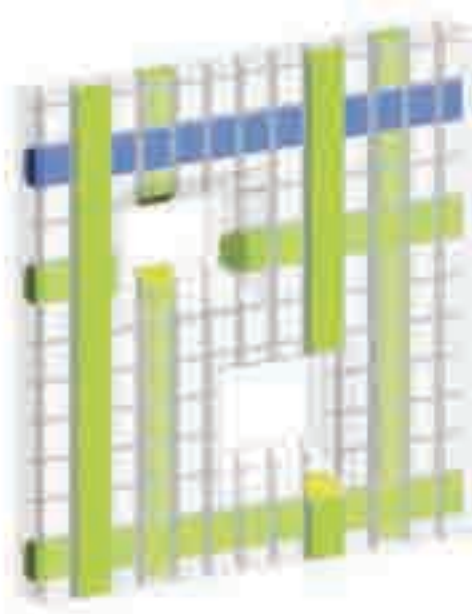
Standard dovetail joint members represented in green. The blue dovetail member indicates addition due to fenestration location.
